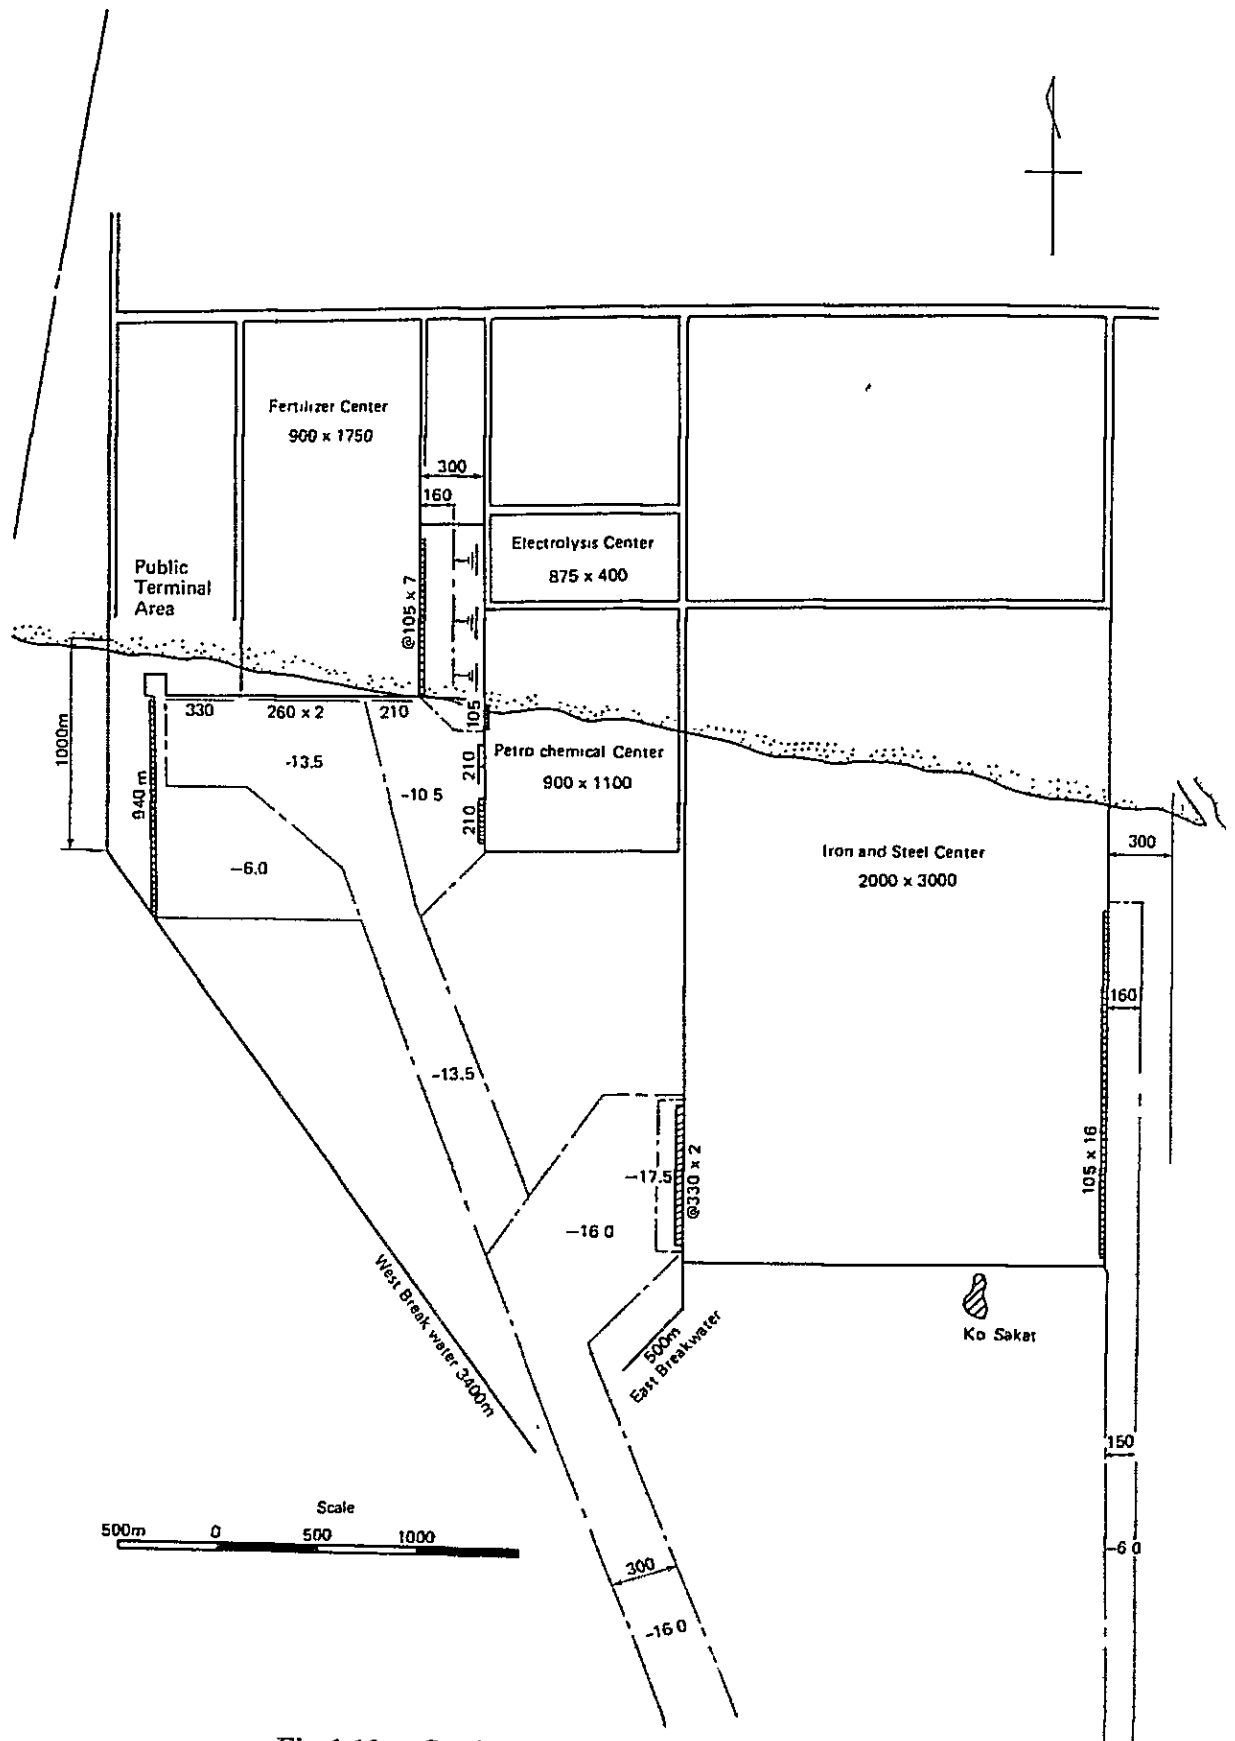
Berth Arrangement [Excavated Type] -(2)
